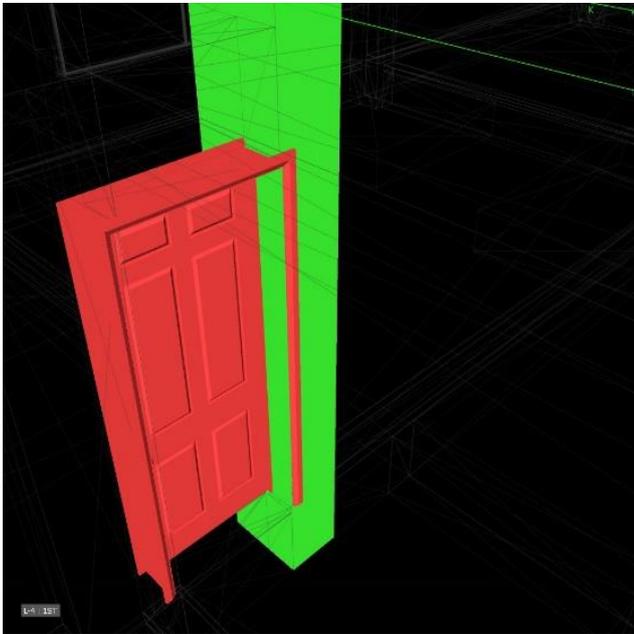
Clash between structural column C1 (Green) and door D2 (Red)
